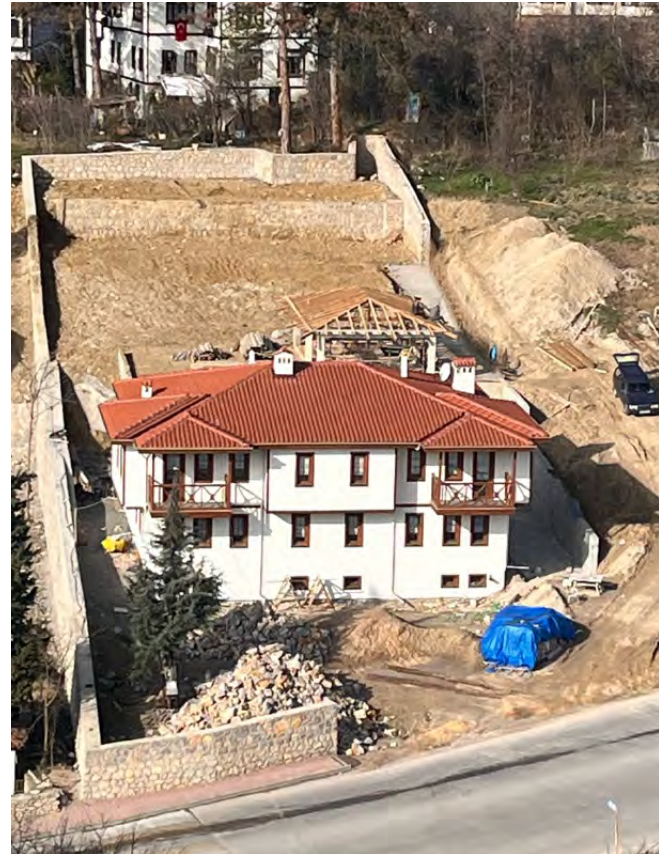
A new reinforced concrete house under construction glimpses the site. Original morphology and top soil have been destroyed. Originally the site was a part of the Viranşehir Voyvoda's Palace.
